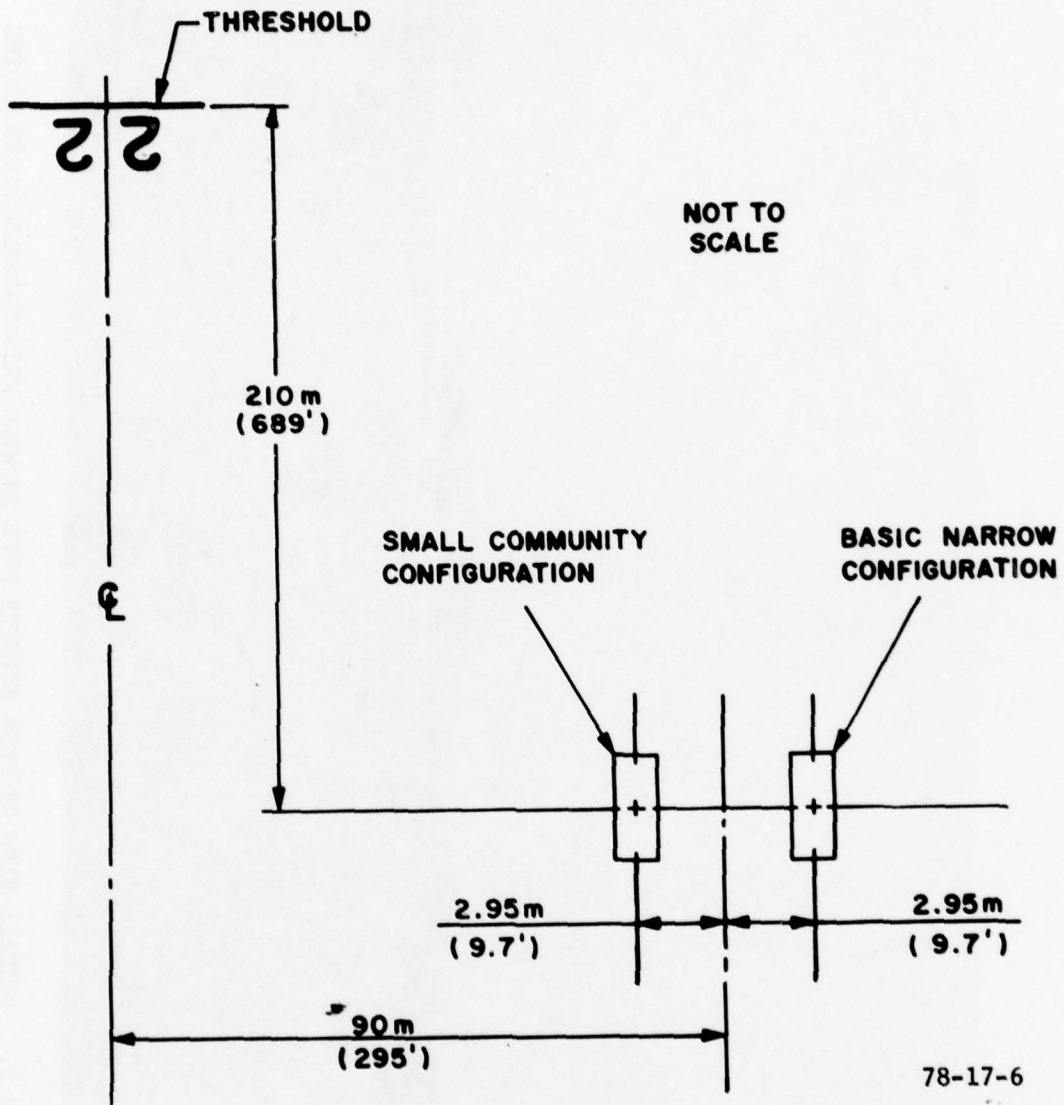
DIAGRAM OF TRSB COLLOCATION ON ELEVATION SITE
